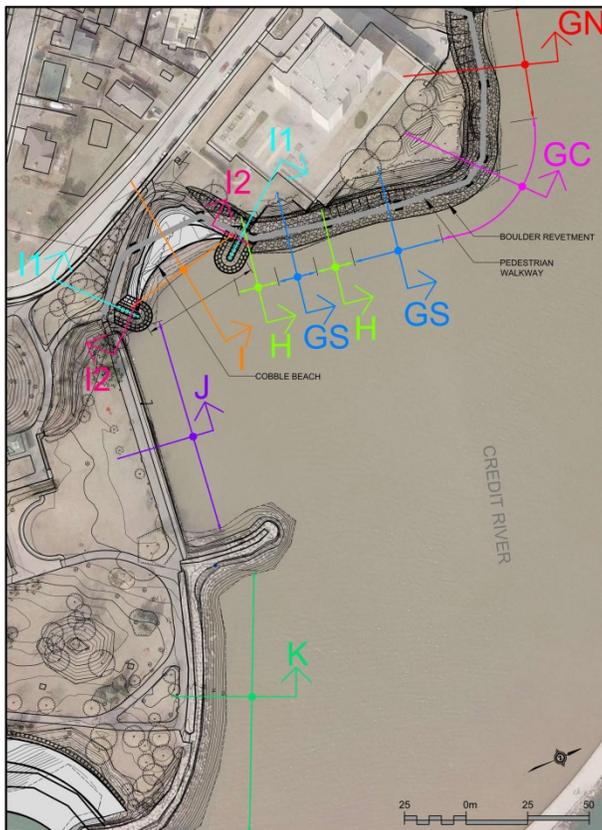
Rivergate Easement and J.C. Saddington Park Cross Sections Key Map
